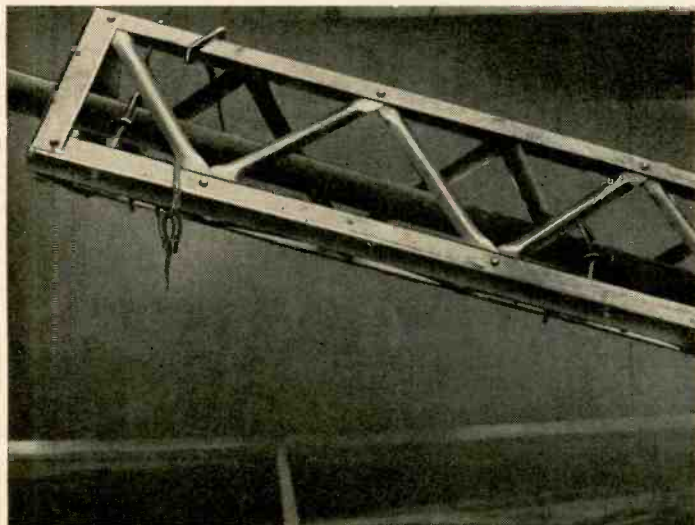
Top section installed on tower. Hook bolts interlock to hold mast in center of tower.
